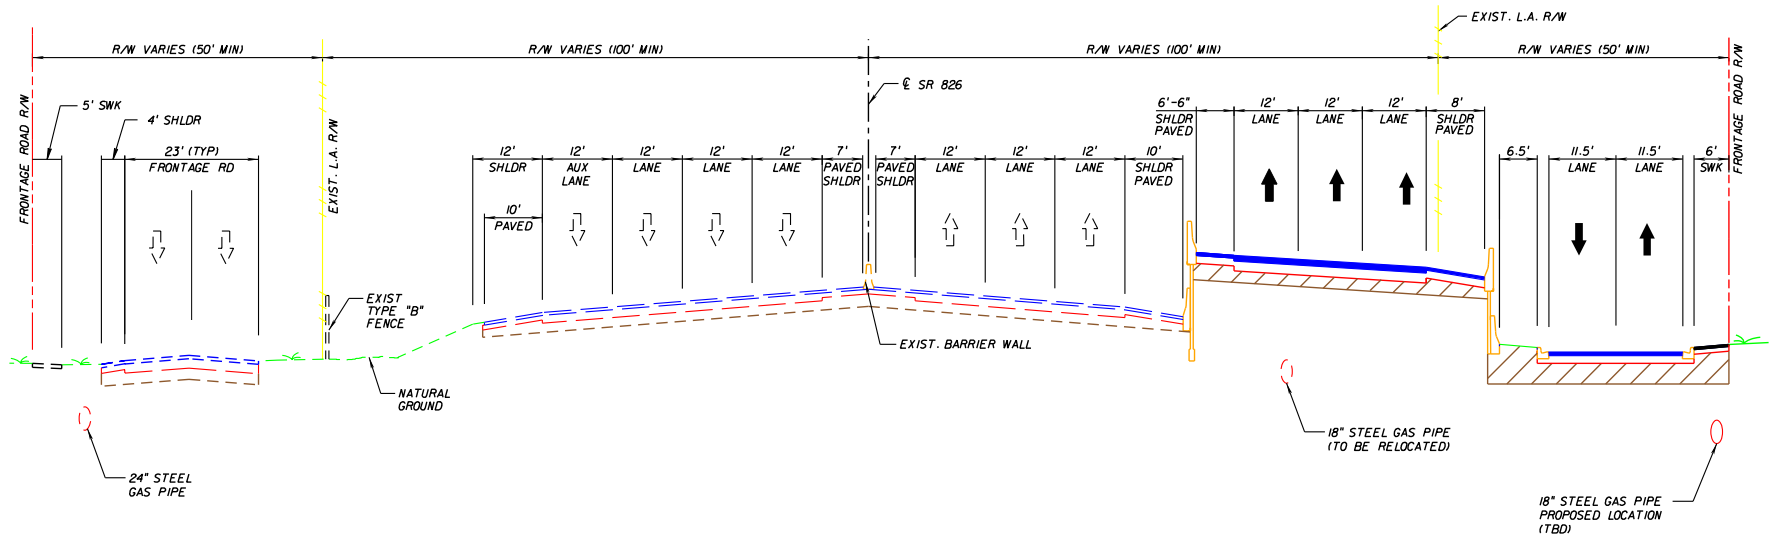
Proposed Typical Section - SR 826 E. of NW 12th Avenue - Alt. 3A, 3B & 3C
